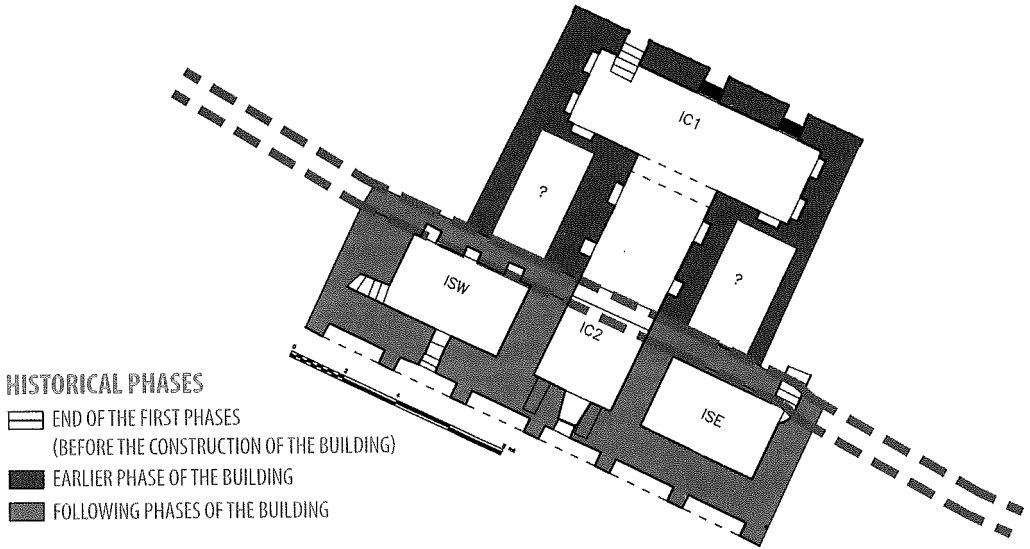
Lower floor plan, with the indication of the probable profile of the ancient town walls
